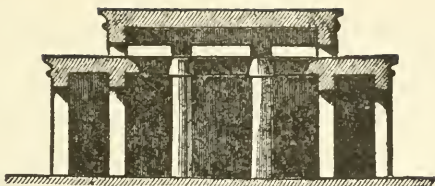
SECTION OF SMALLER PILLARED HALL, GREAT TEMPLE, KARNAK.—Page 108.
